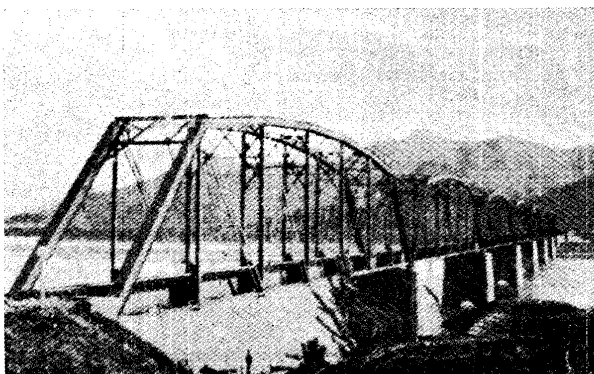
Nakdong-gang at Waegwan*. Single-track railroad bridge, now paralleled by second single-track bridge.
